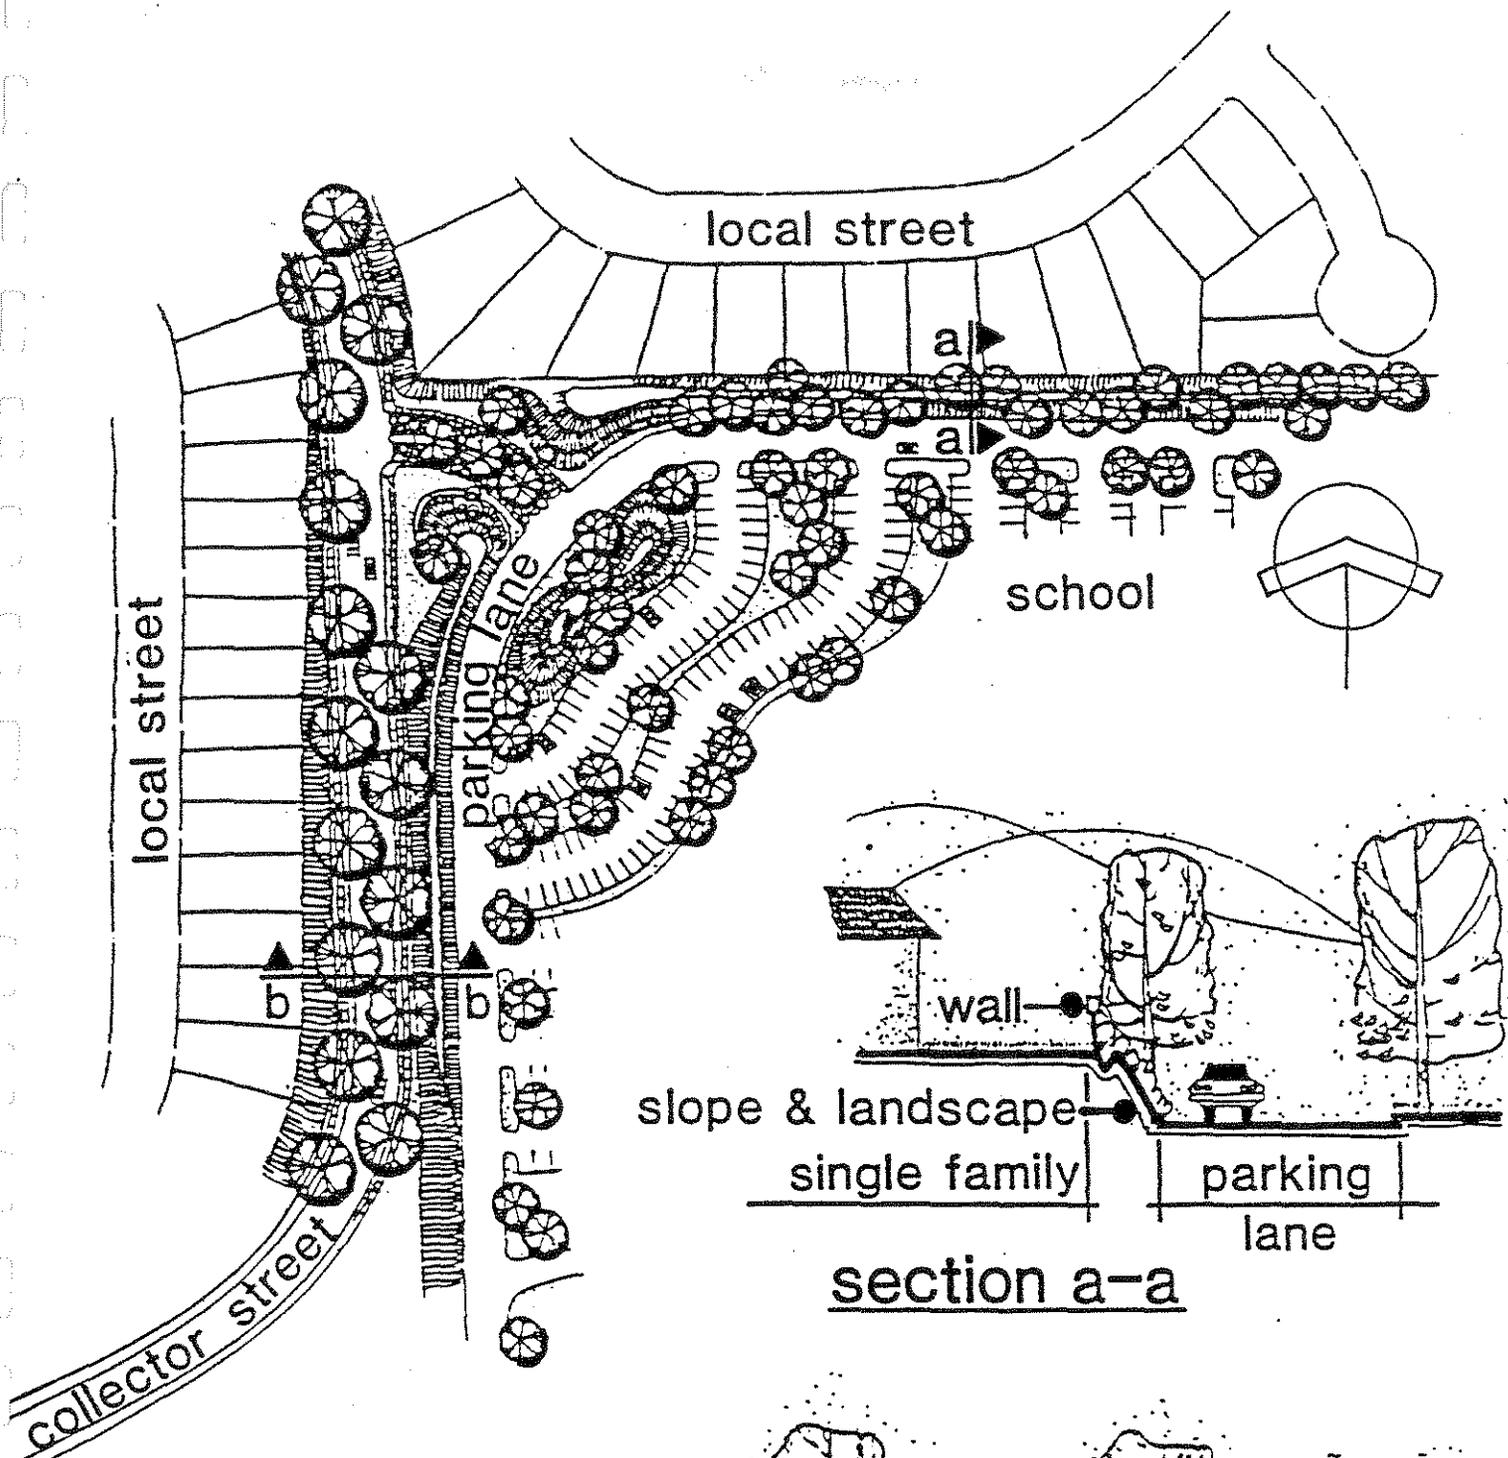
indicates proposed design solutions. Residential areas above the parking lot on the north would be buffered by a perimeter wall serving as a visual and noise barrier. Plantings on slope banks extending to the parking area below would further screen views. On the west, the small-lot residential area would be separated from the parking area by the collector road. The parkway on the east side of the roadway would be bermed and heavily landscaped to screen out the parking. Residences on the west side of the collector would be buffered by grade differentials, a perimeter wall, and parkway plantings. These elements supplement a circulation system designed to avert vehicular and pedestrian conflicts between the high school and residences.
